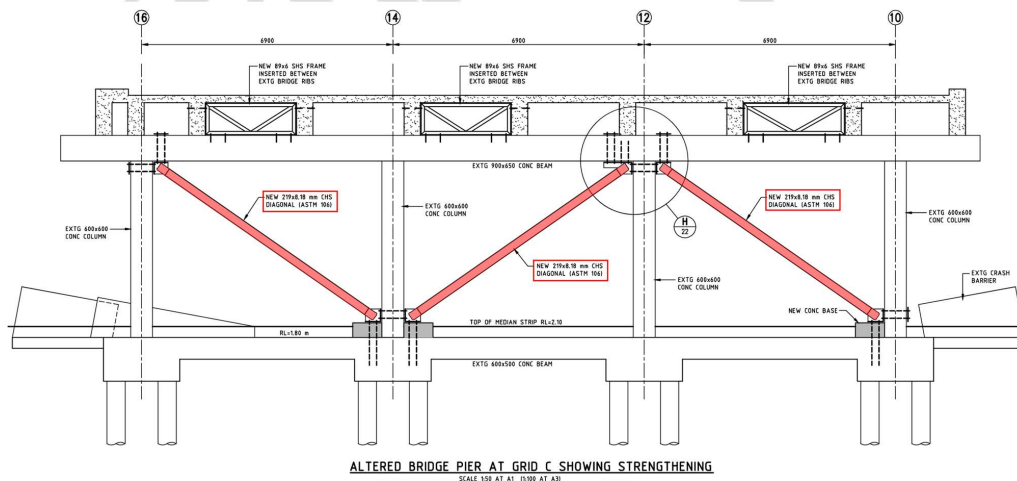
Diagonal cross braces installed at the west and central piers in 2011 as part of the Spencer Holmes strengthening scheme.
